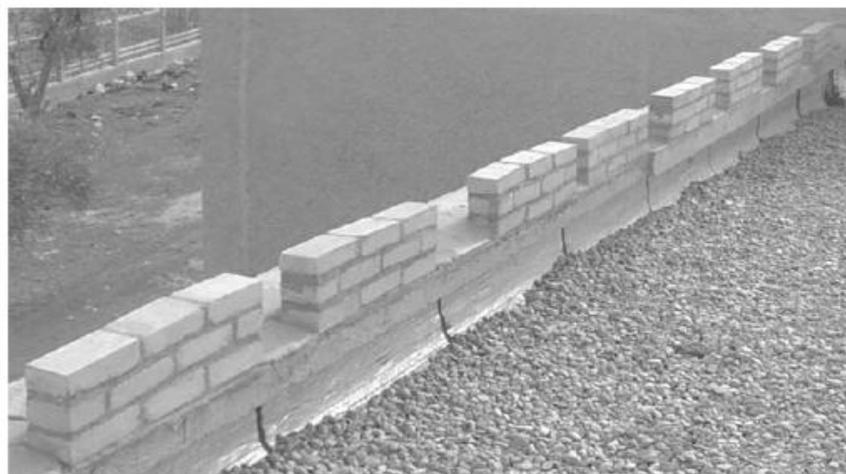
General view of the built walls. Source: *Durability study of stabilized earth concrete under both laboratory and climatic conditions exposure.
